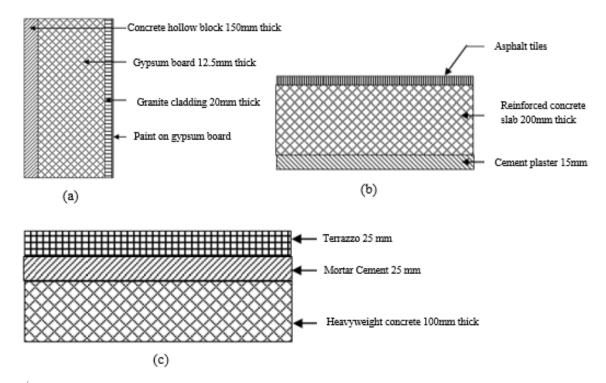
Building envelope details (a) Wall cross-section, (b) Roof cross-section and (c) Floor cross-section [11].
